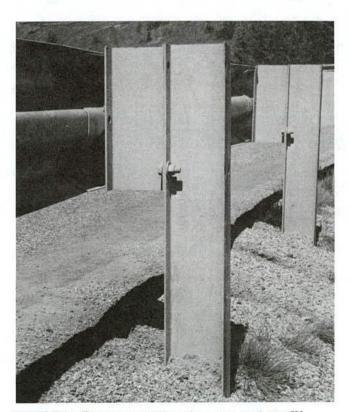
Typical installation of a strong steel-post W-beam guardrail (SGR04a).
